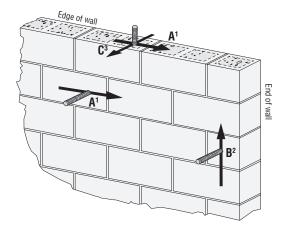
B. Allowable Anchor Locations of 1/6"-Diameter Threaded Rod and #4 and #5 Rebar for Full and Reduced Load Capacity When Installation Is in the Top of Fully Grouted CMU Masonry Wall Construction
